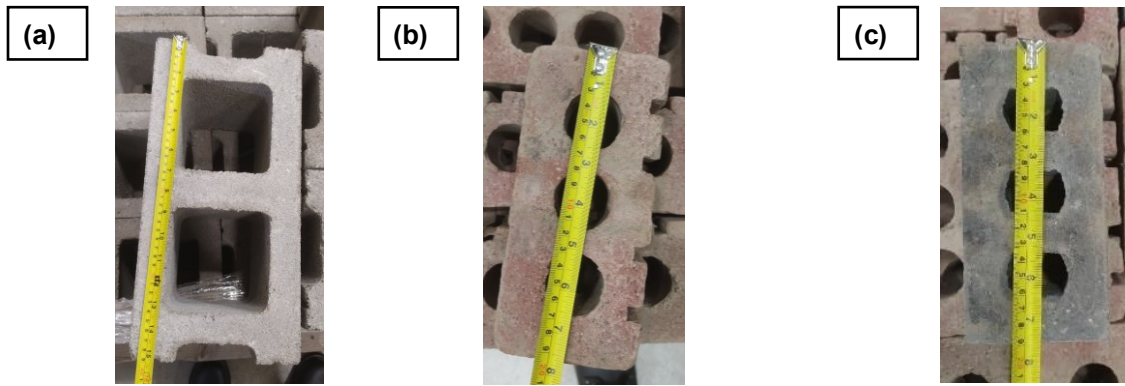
Masonry units: a) concrete masonry unit, b) clay brick, and c) concrete brick.
